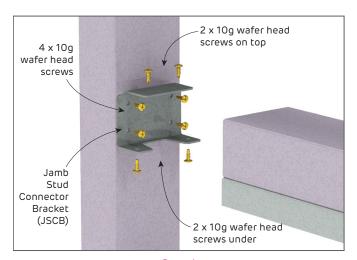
Header to Jamb Stud Connection for Prefabricated Door Frames Elevation
